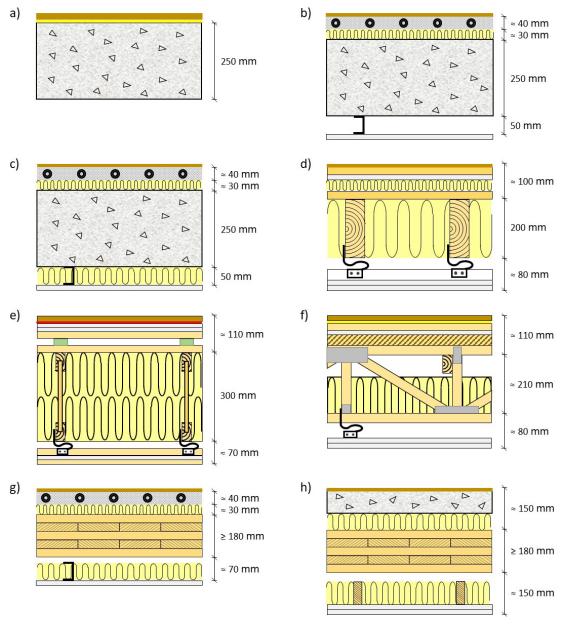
Examples of slabs between dwellings. a-c) show concrete slabs, d-f) light-weight wooden constructions (adapted from SINTEF Building Research Design Guide 522.511 [17], and g-h) cross-laminated timber (CLT) constructions.
